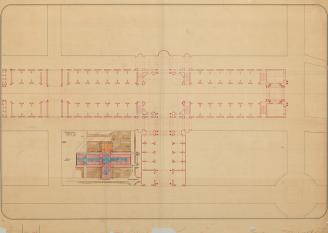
The "Galleria Oretea": planimetric development and urban setting (Damiani Archive).
